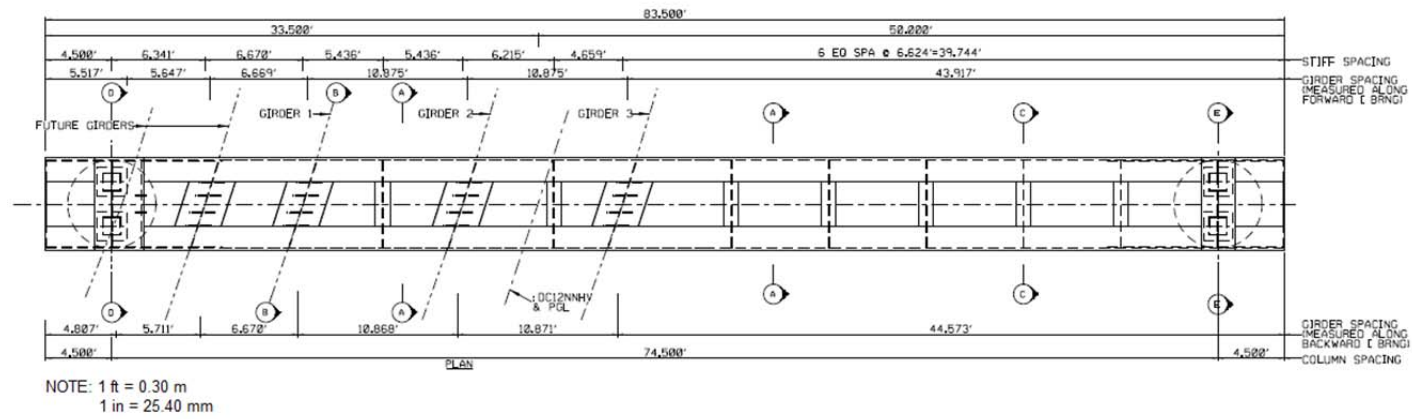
Plan View Geometry of Steel-Concrete Composite Cap
